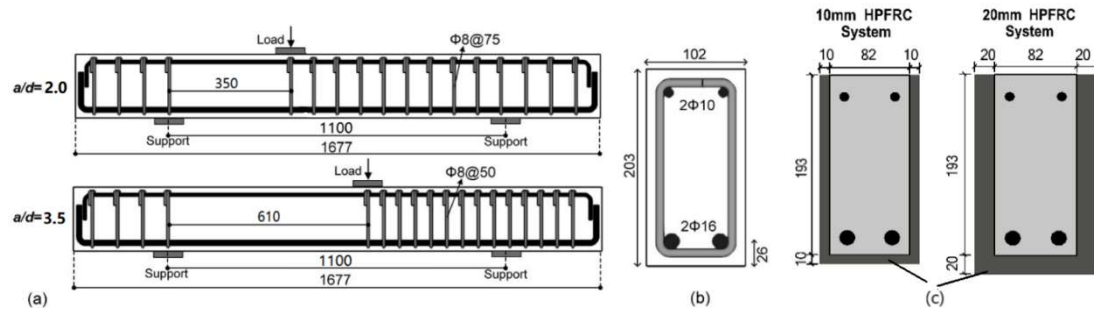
Beam Details: (a) Layout of the reinforcement of the beams; (b) Cross section; (c) Strengthening configurations.
